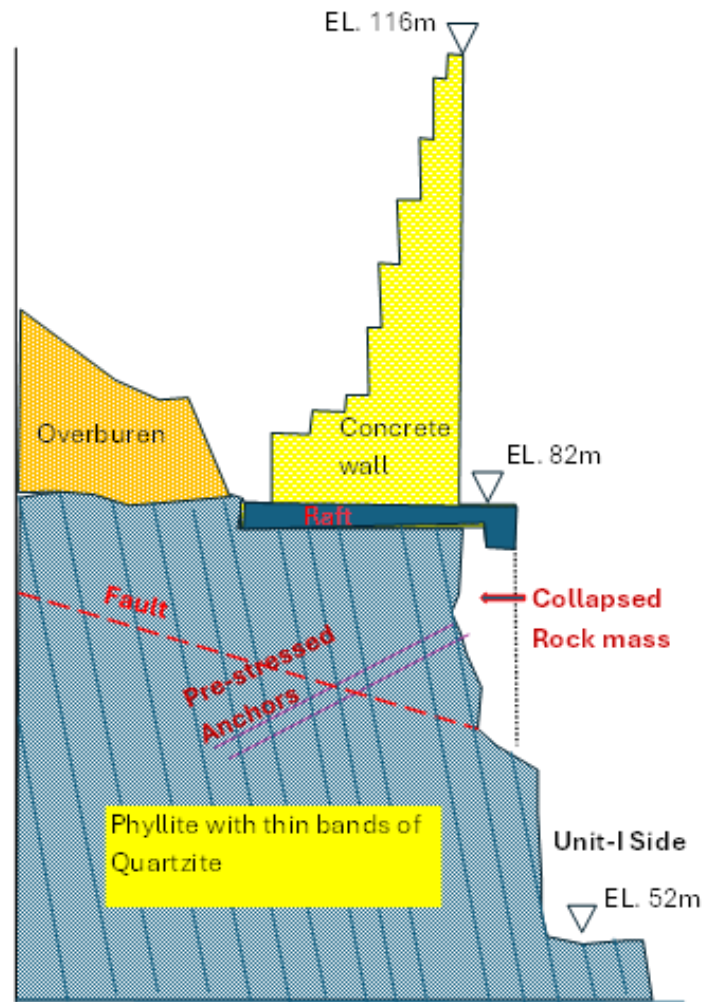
Typical cross-section of Flood Protection Wall and Foundation during Progressive Construction.
